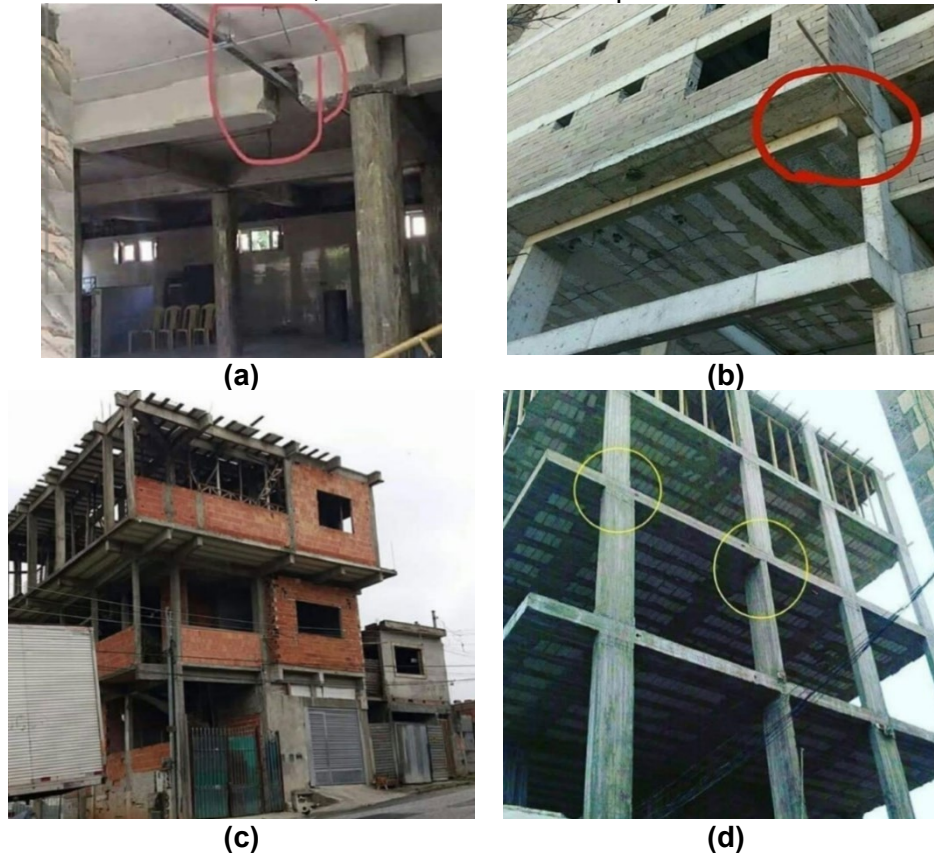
Construction problem and mistakes: (a) destroy the beams due to equipment installation; (b) connection problems between columns and beam; (c) illegal cantilever slabs; (d) incorrect connections between columns
